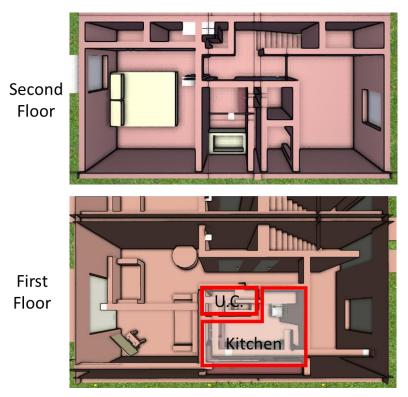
Top-down view of the first and second floors of the townhouse.
